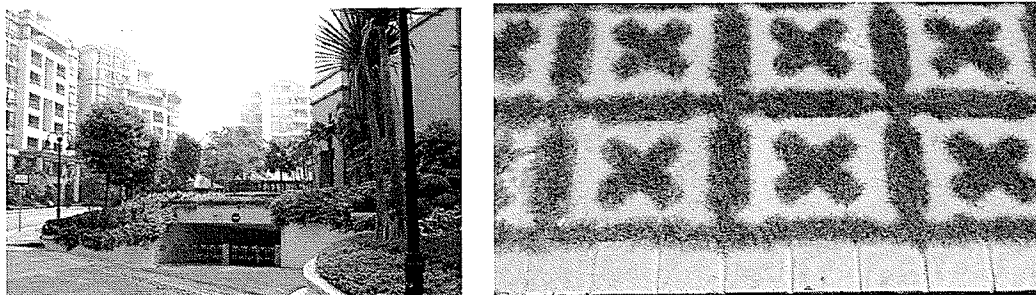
Underground parking facilities (left) and concrete grass blocks for ground parking (right)
